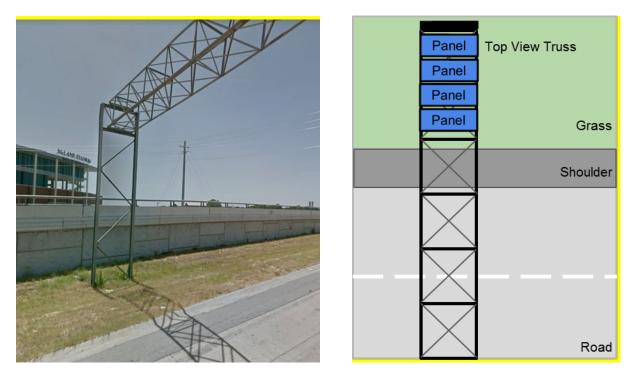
Photo and Diagram. Typical solar panel installation - top of truss.
